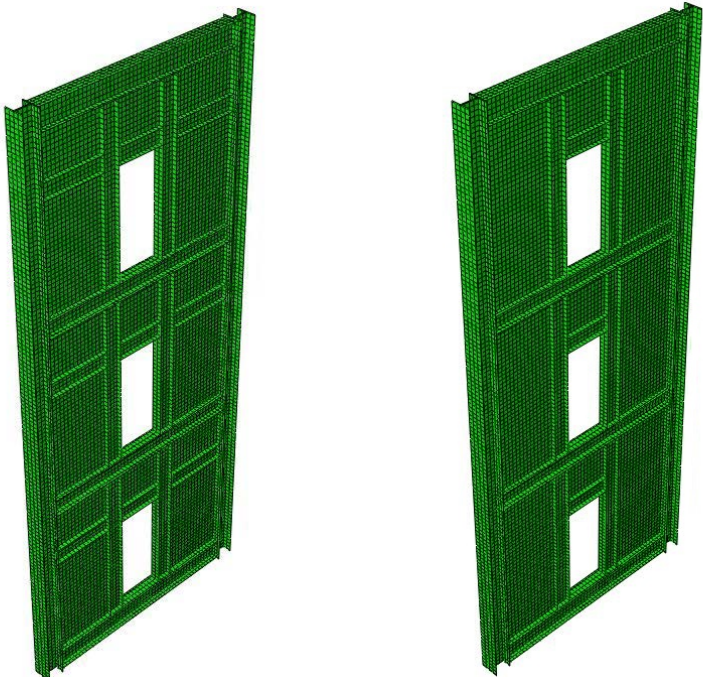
3- storey SPSWs with: stiffeners arrangement according to AISC (model-2)(left); proposed stiffener arrangement (model-1)(right)
